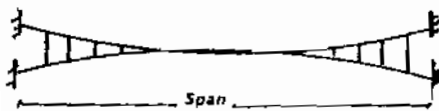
Concave Cable Roof with Infinitely Rigid Supports.
